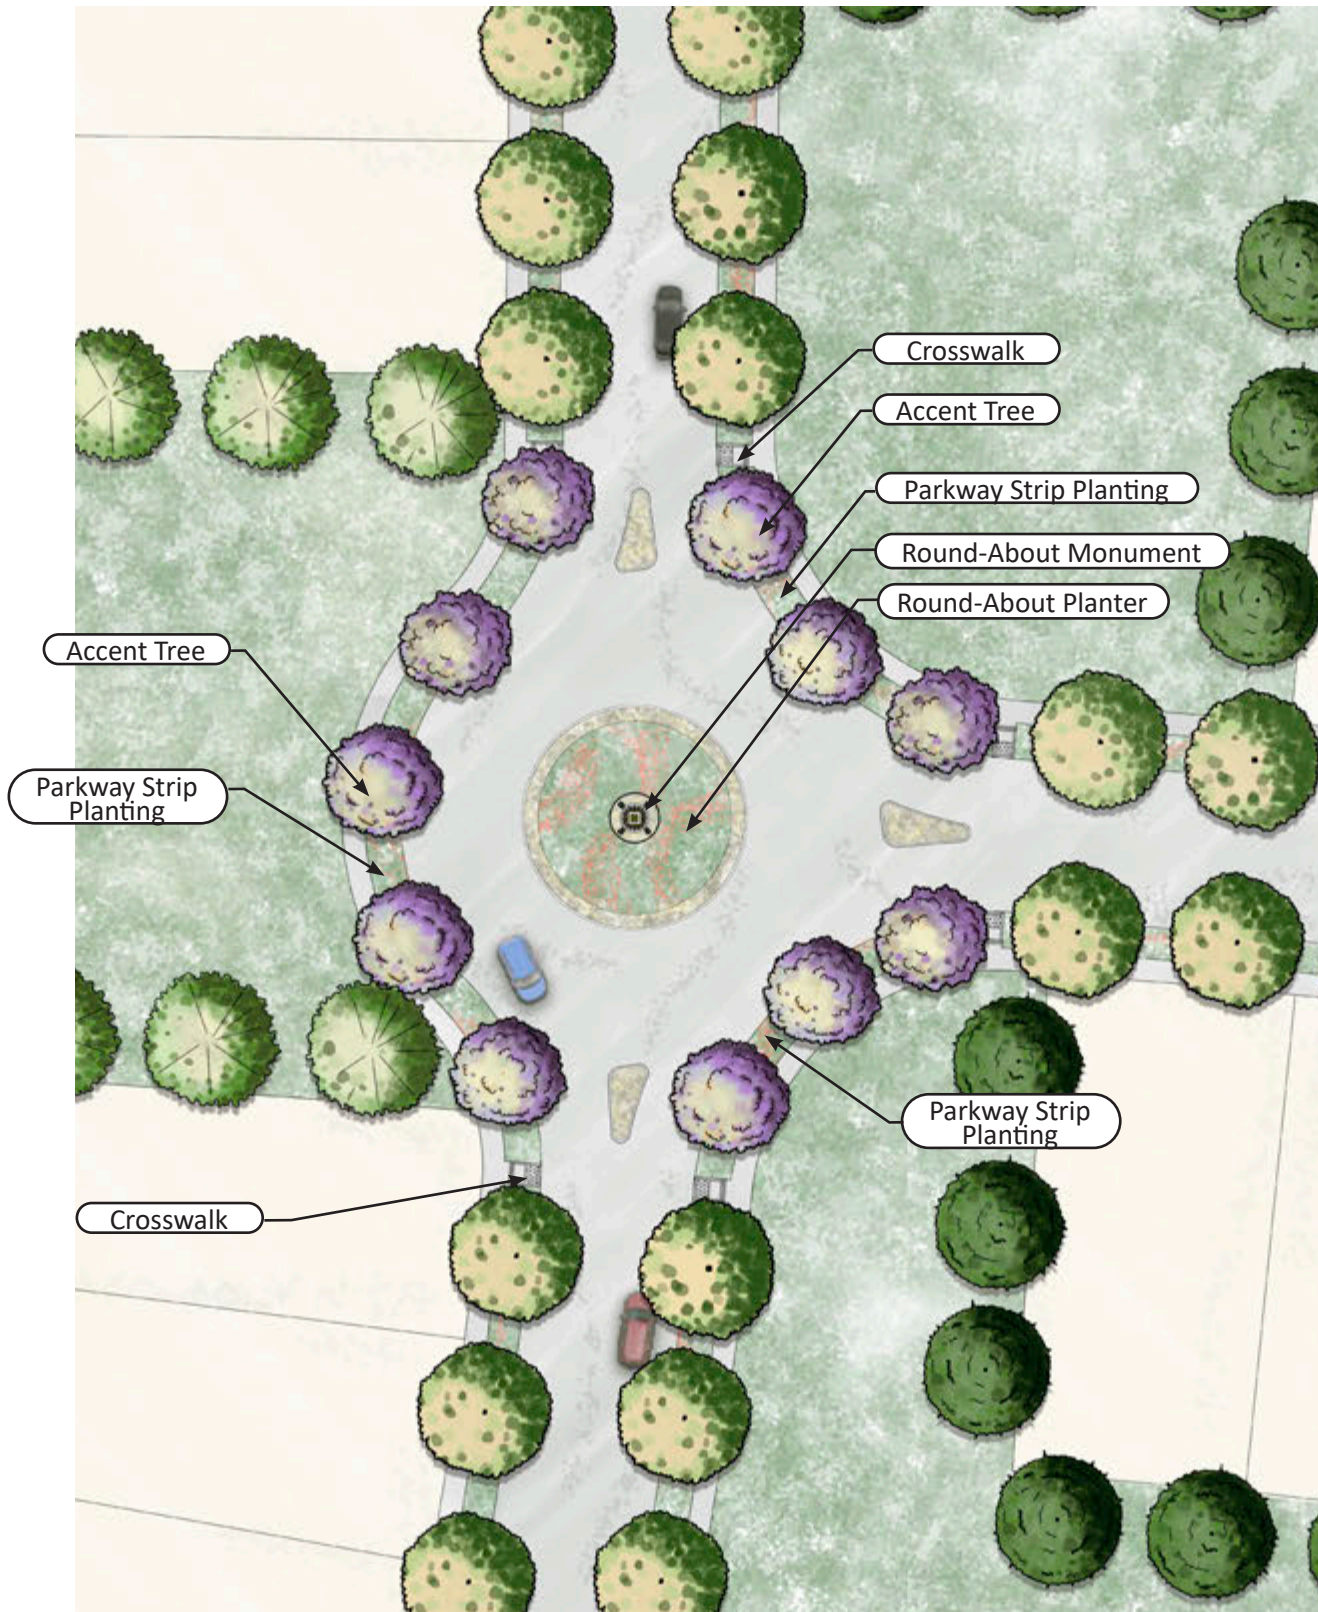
CALLERTON AVE & HARBOR VIEW AVE GATEWAY & ENTRY CONCEPT PLAN
